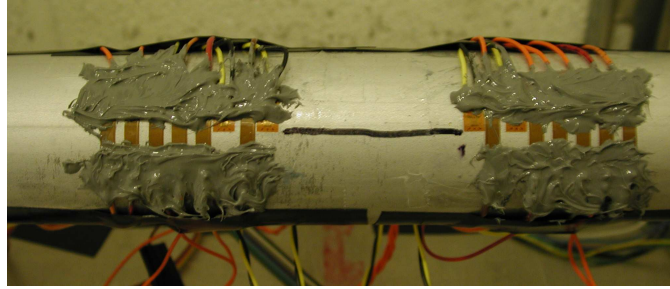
A pre-test photograph of crack detection gages and strain gages. The surface notch was marked in black with a pen (free hand).
